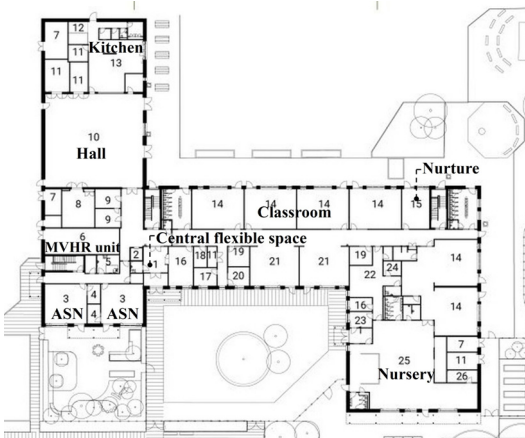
Ground floor plan, Riverside primary school (drawing: architype)
